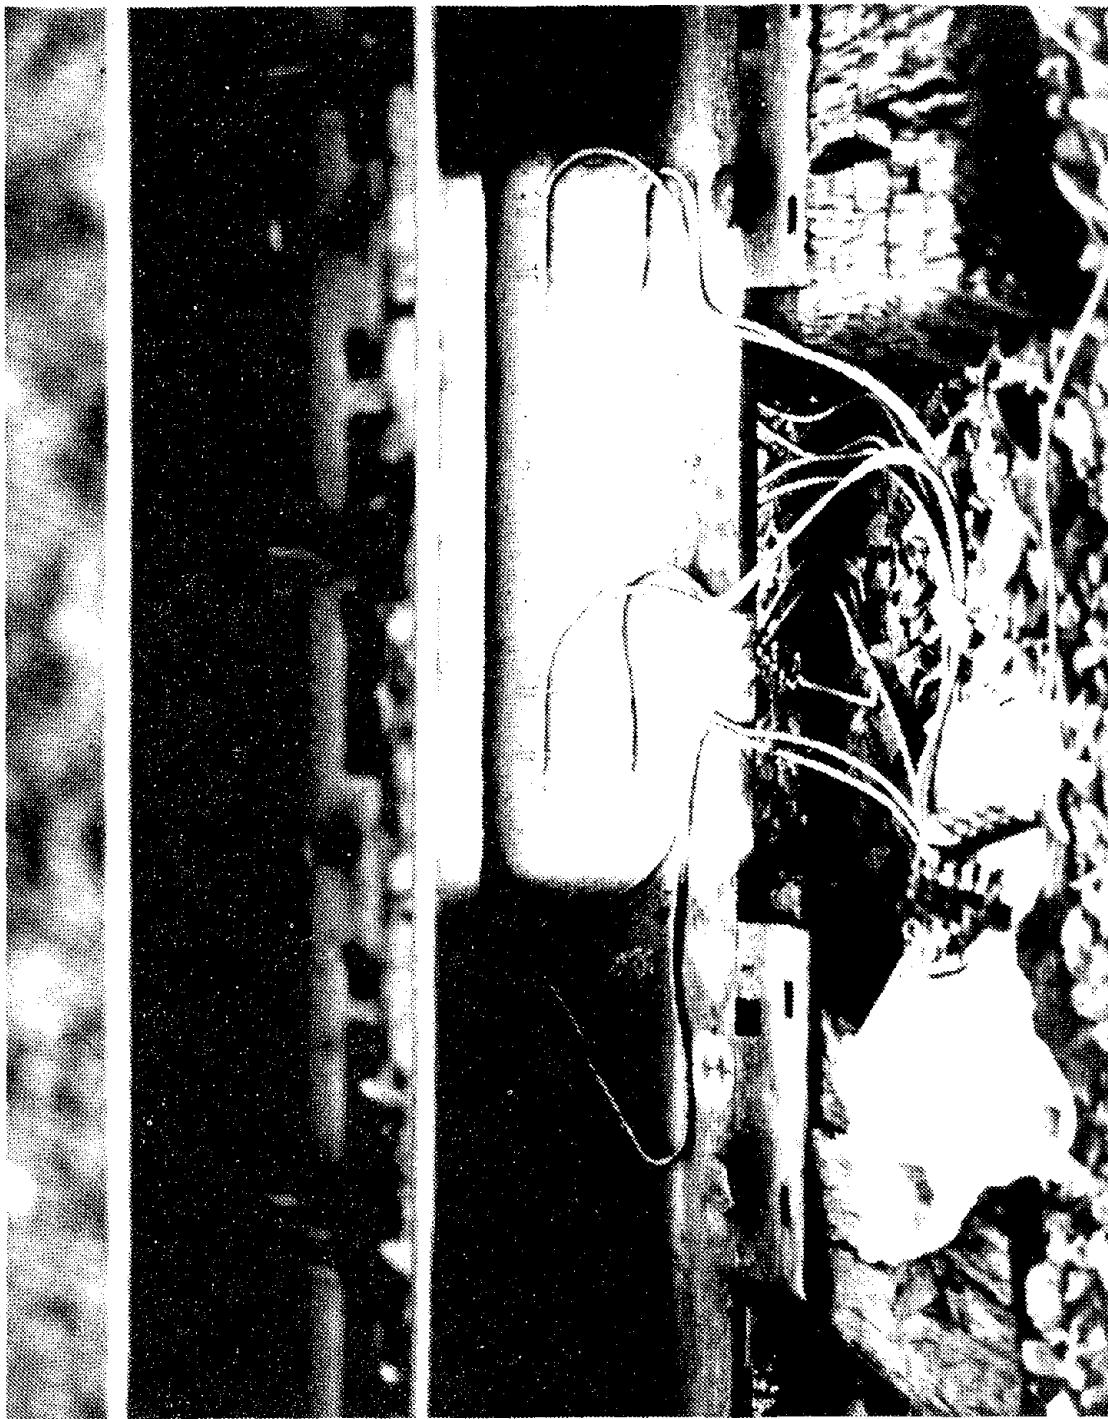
TYPICAL WAYSIDE GAGE INSTALLATION
